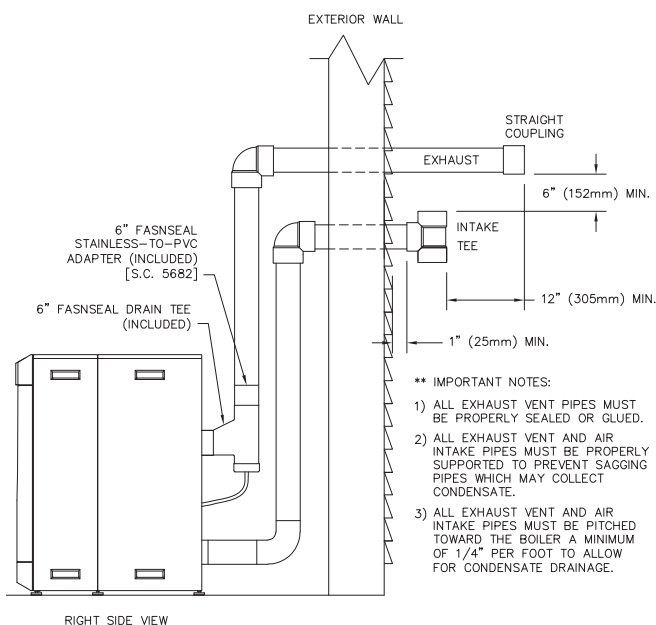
Sidewall Exhaust Vent and Air Inlet Pipe
